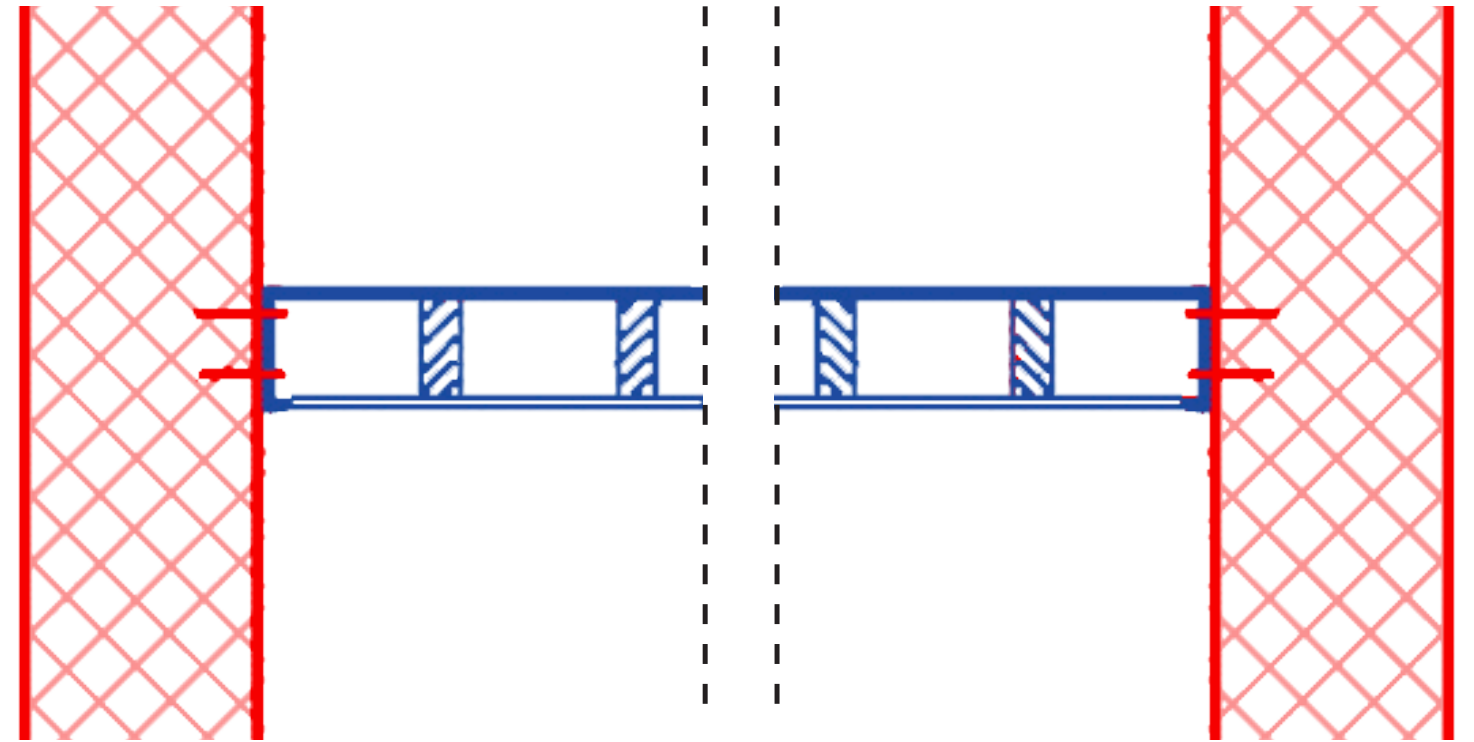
Steel crossbeam within Superlofts Houthavens plot 2, sketch detail. (Own work)
